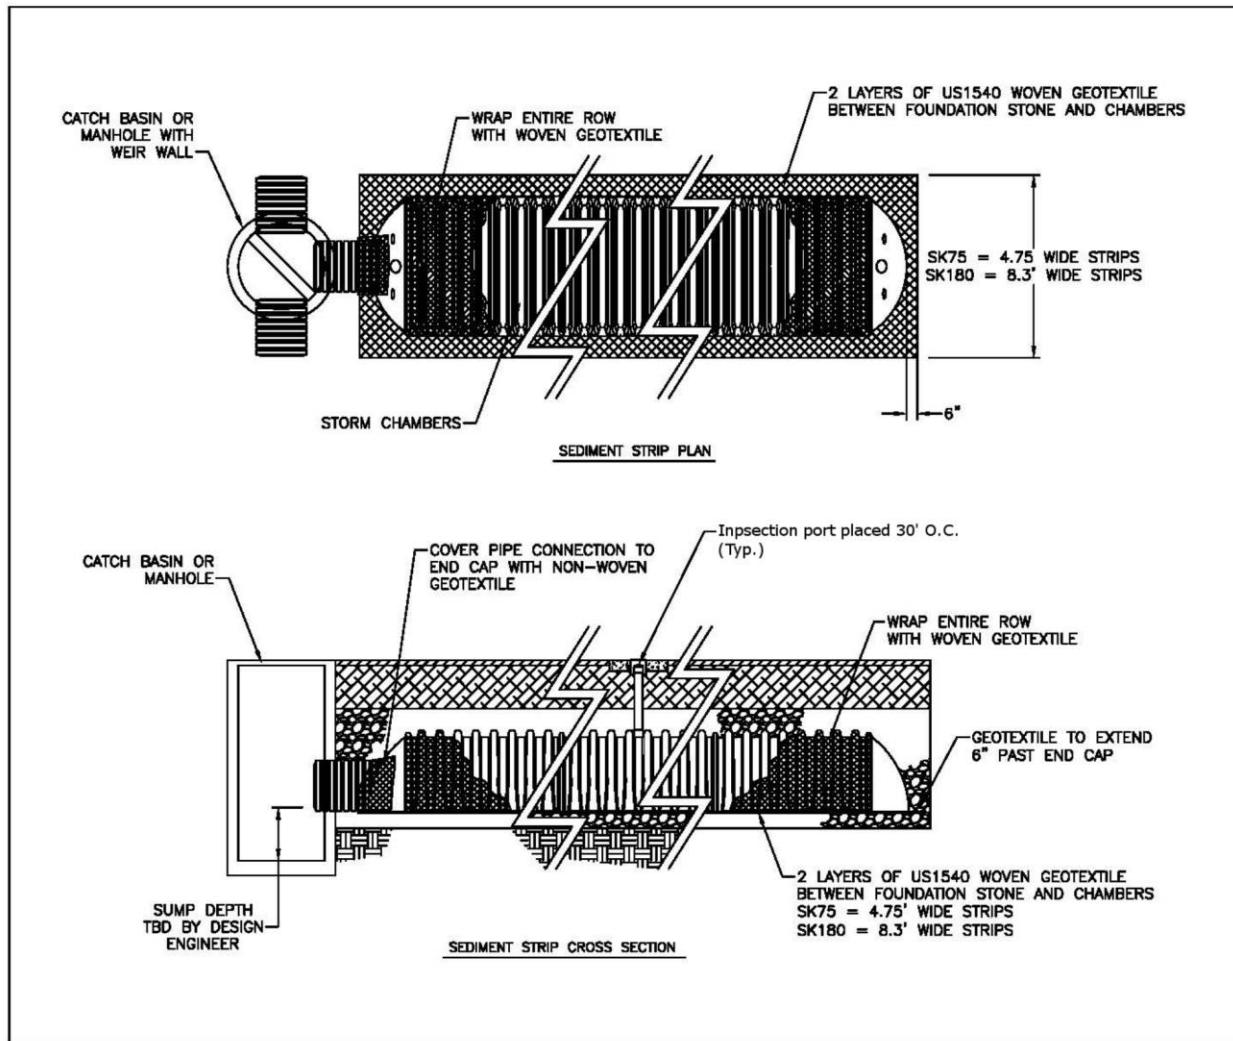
Stormkeeper Chambers Sediment Strip Detail
